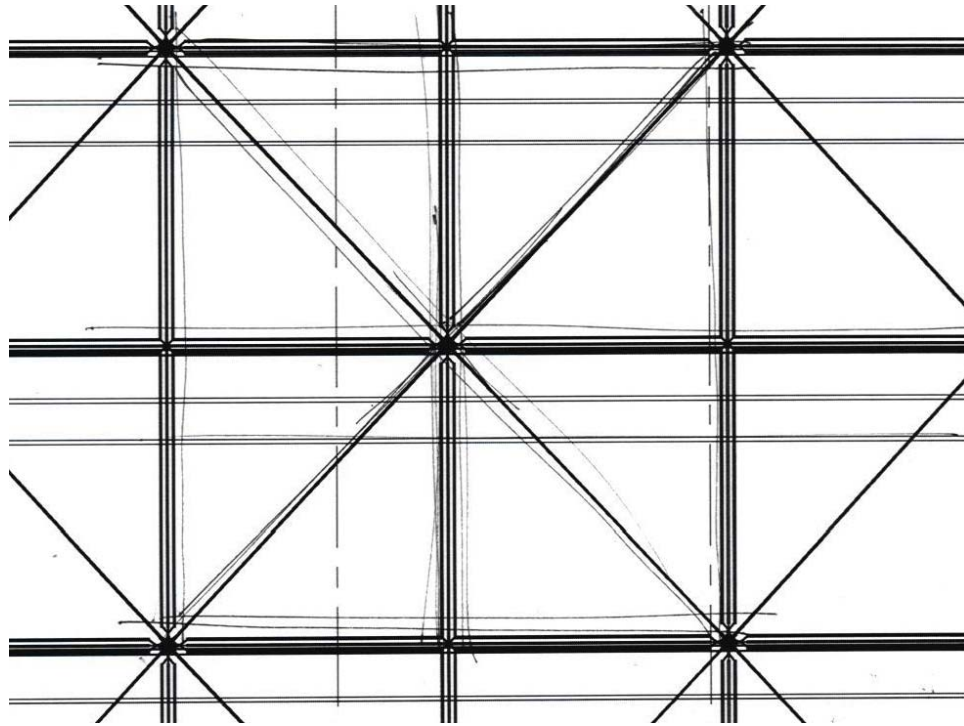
The typical louver panel on the north and west façades to protect the building against direct rays of the sun.
